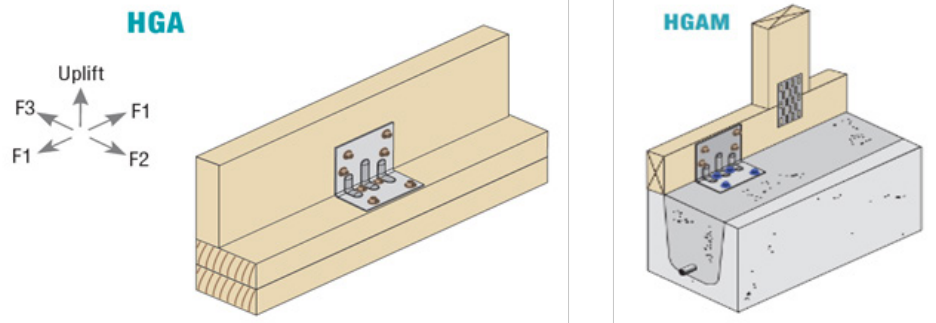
HGAM Load Directions for Wood and Masonry Applications
